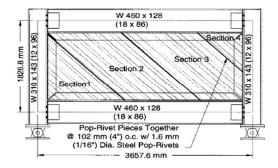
Configuration of the Corrugated Steel Plate Shear Wall [2]
